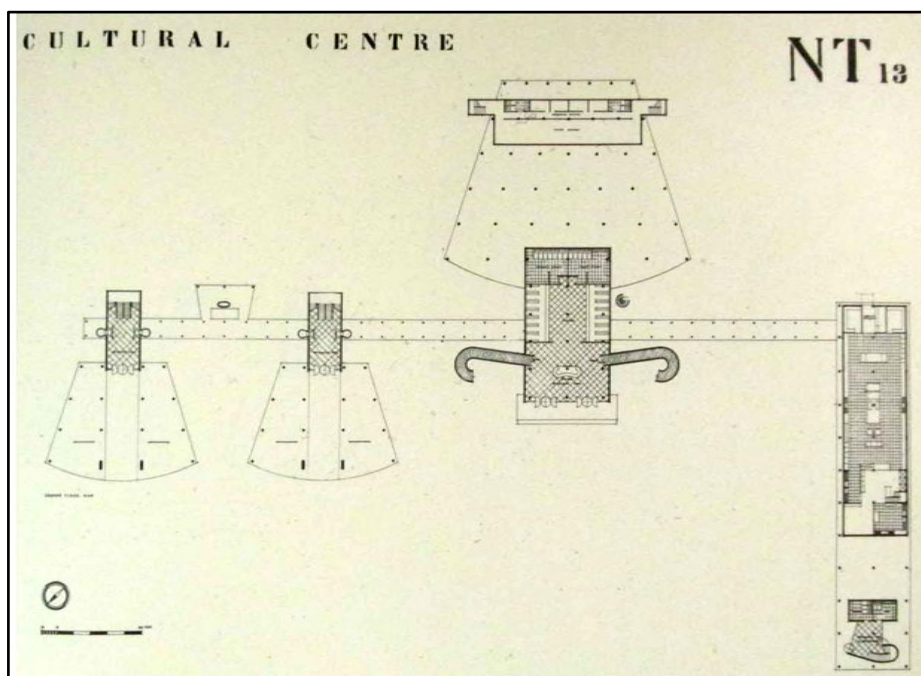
Ground floor providing access to the raised facilities of the proposed town hall in Kwa-Thema.
